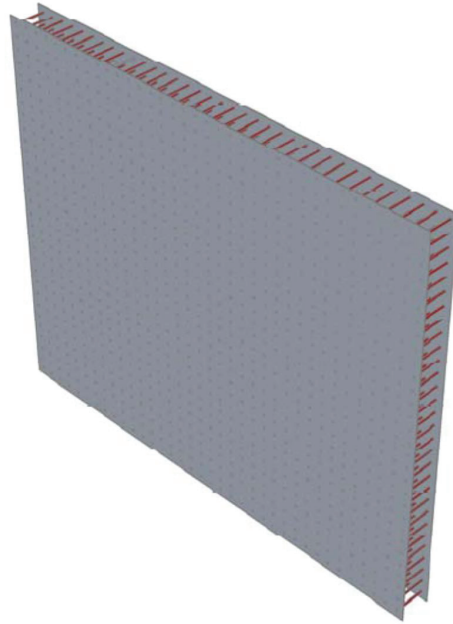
Prototype 2 Wall Pier 3-D Rendering
